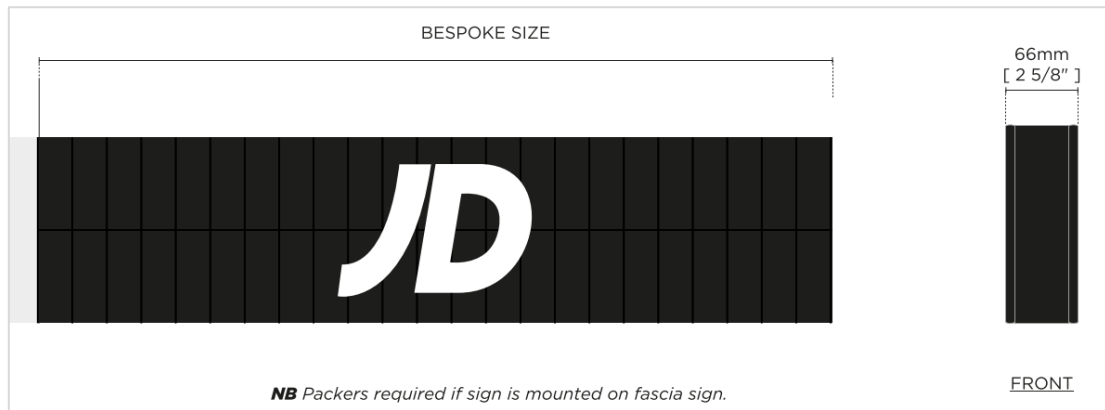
Flag sign specifications - proposed under Bourke Street canopy
